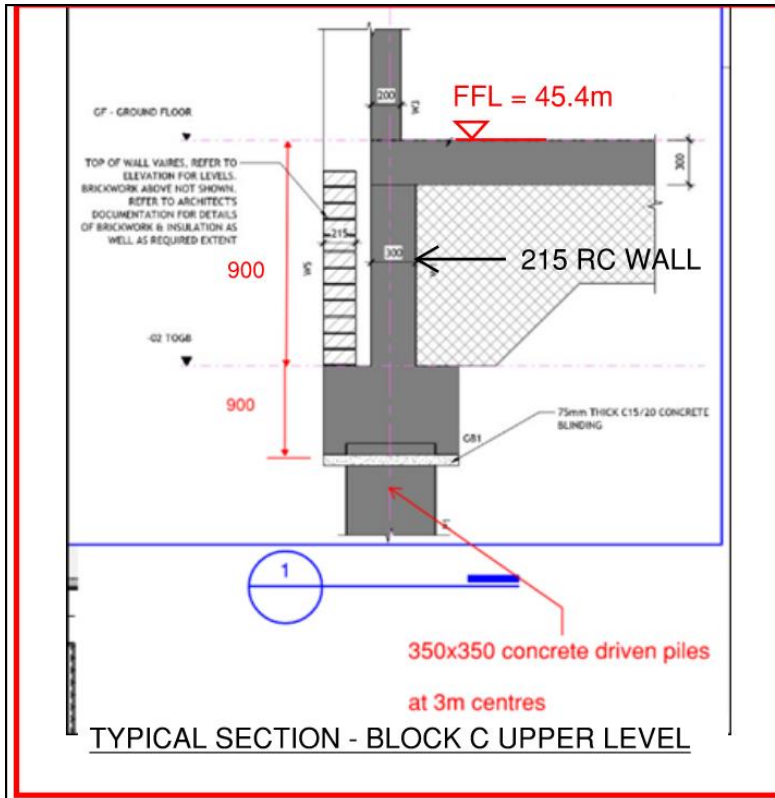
Typical Piling Foundation and Retaining Wall Design
